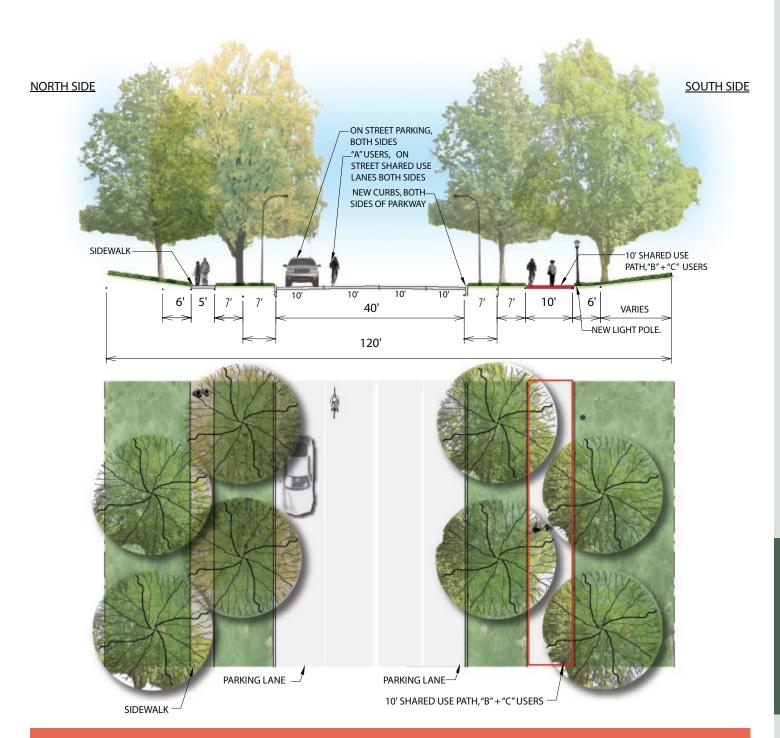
Eastern Parkway: Zone 1 Prototypical Section & Plan - Cherokee Park to Bardstown Road
